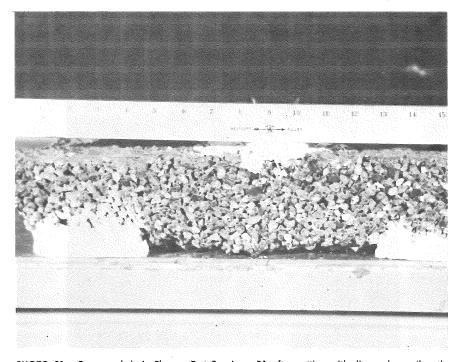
Pea-gravel drain Flexure Test Specimen B1 after cutting with diamond saw (length to depth ratio approximately 3).
